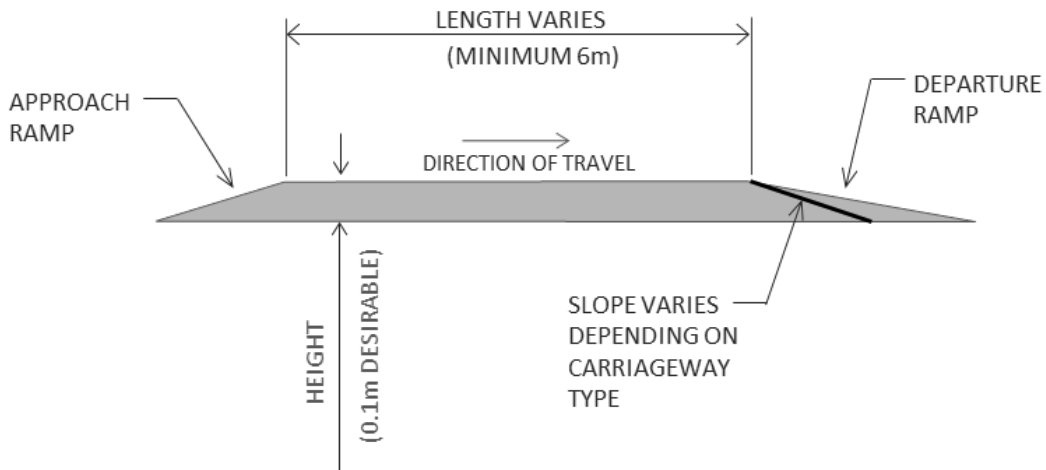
Typical RSP shape (Source: VicRoads Road Design Note RDN 03-07, modified.
